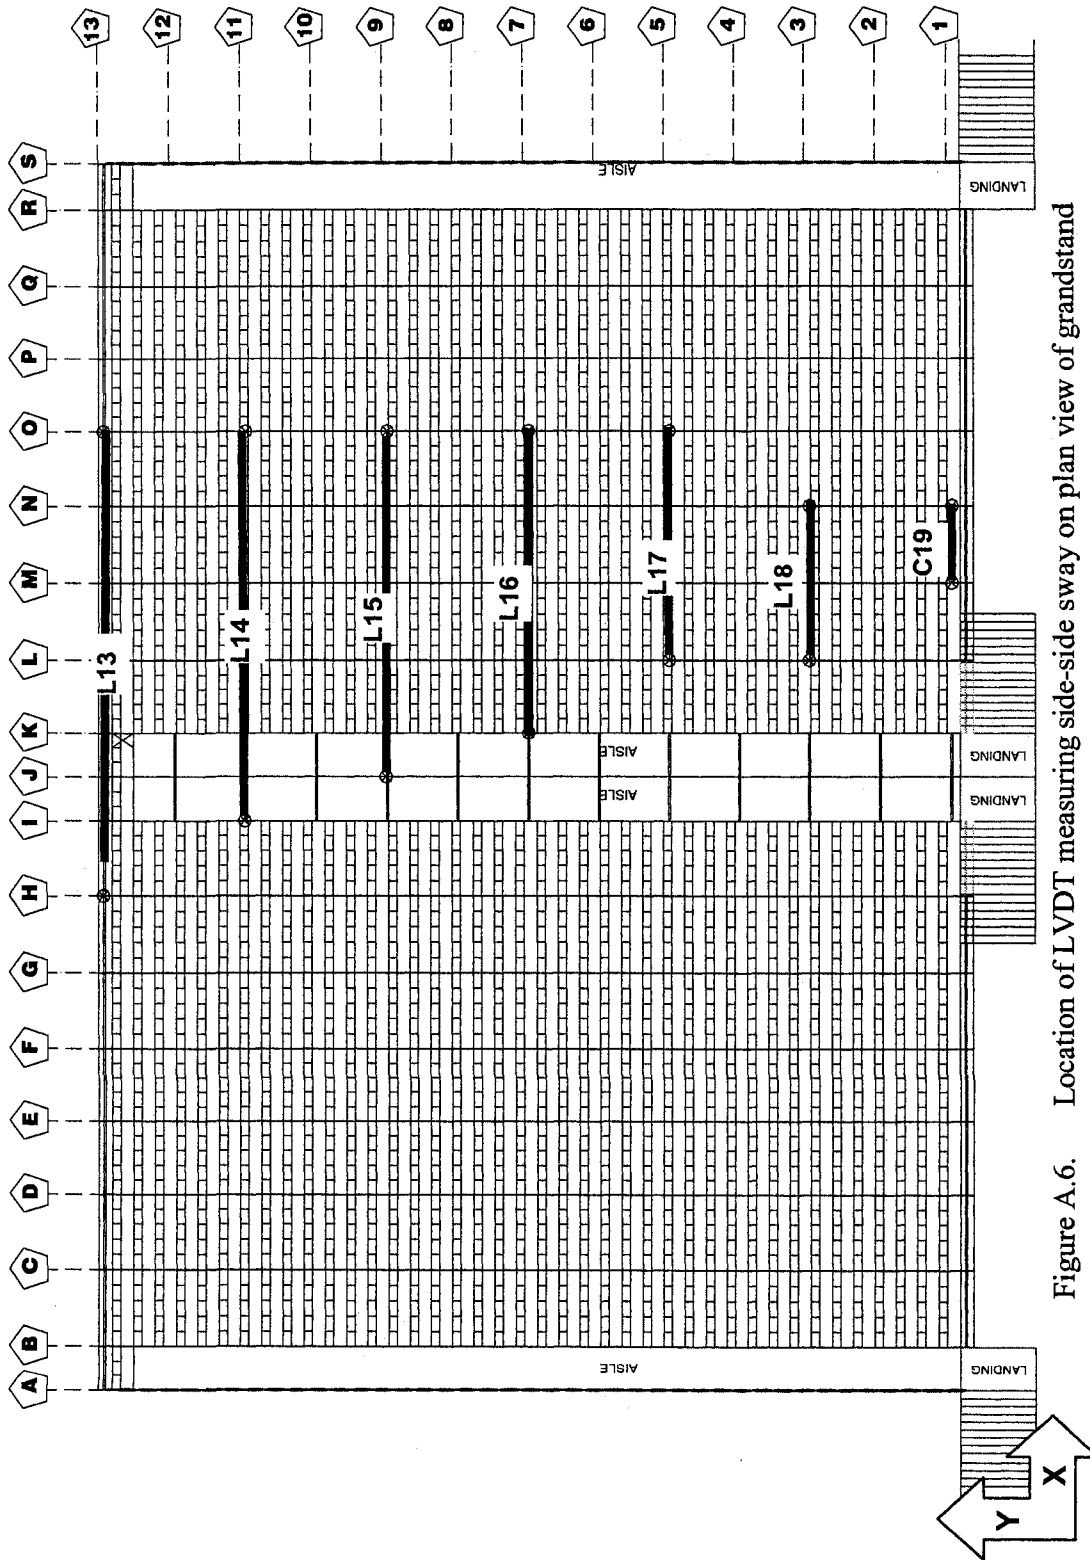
Location of LVDT measuring side-side sway on plan view of grandstand
